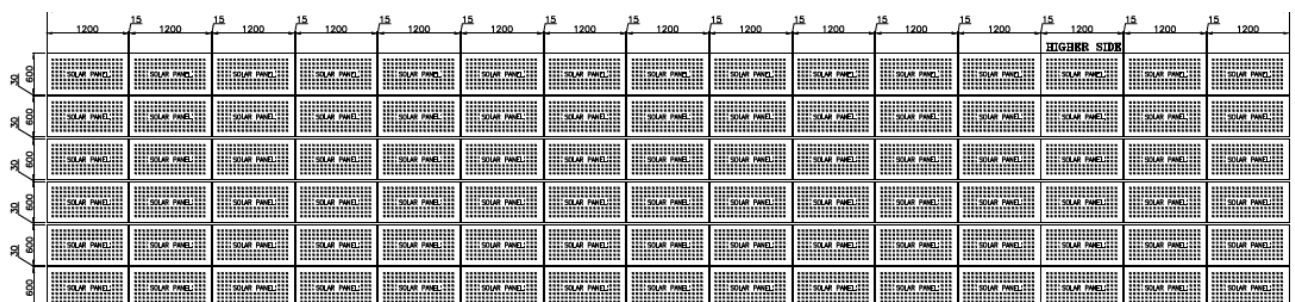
Typical Fixed Tilt Module Mounting Structure (front side)
